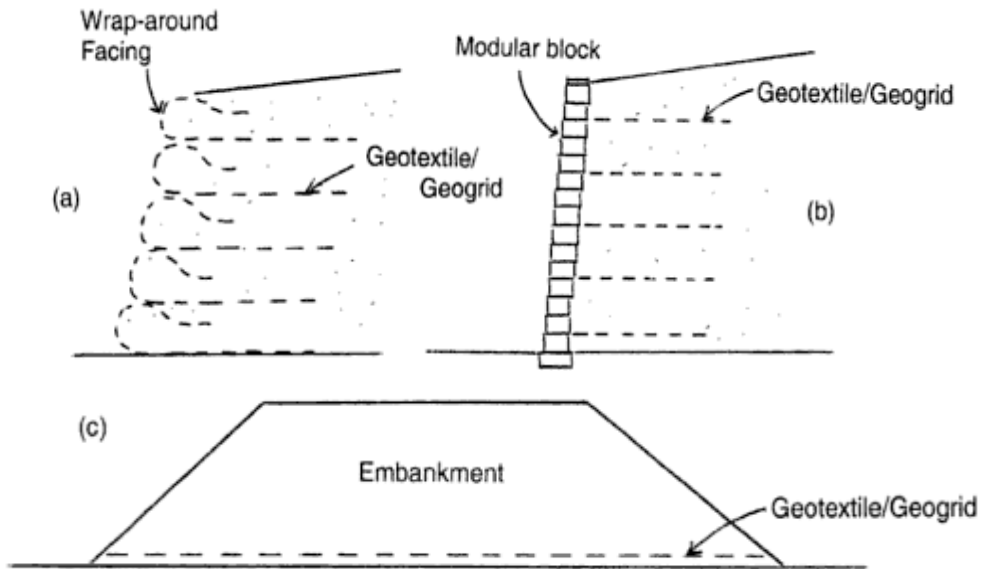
Reinforced structures: (a) Steep Slope, (b) Retaining Wall, and (c) Embankment [3]
